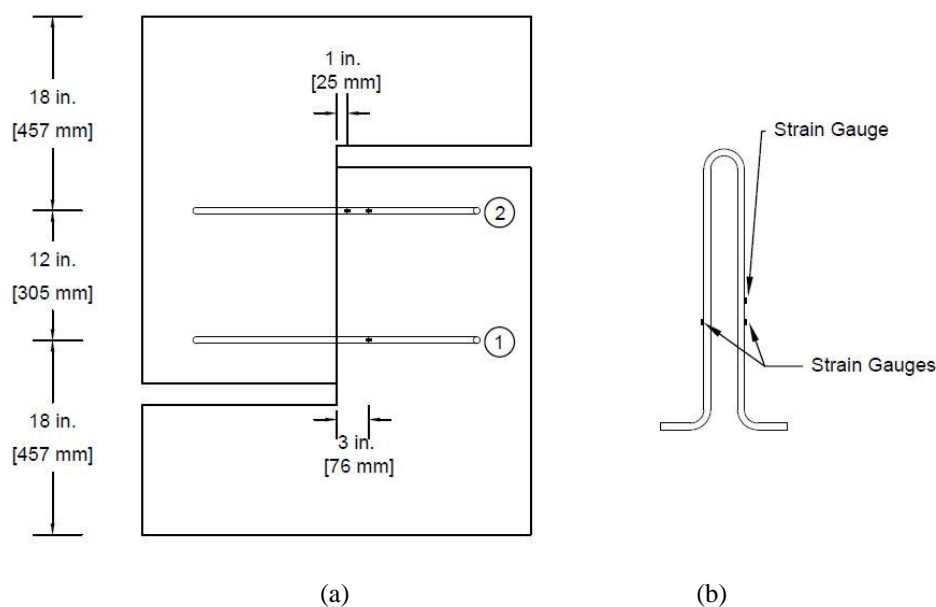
(a) Internal instrumentation elevation for specimens constructed with 2 reinforcing steel U-bars; (b) U-bar.
